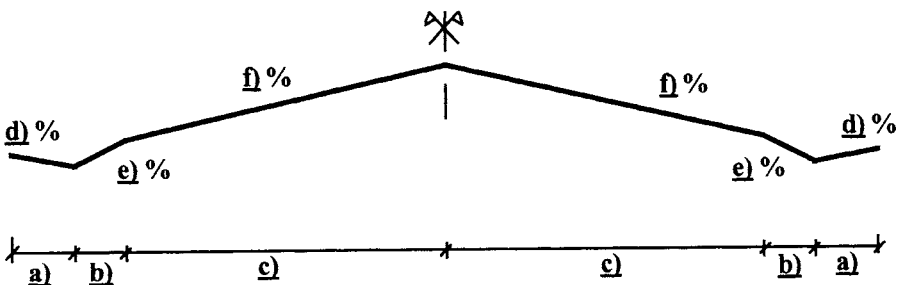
Standard road transverse section where the user fills in the several writing fields
